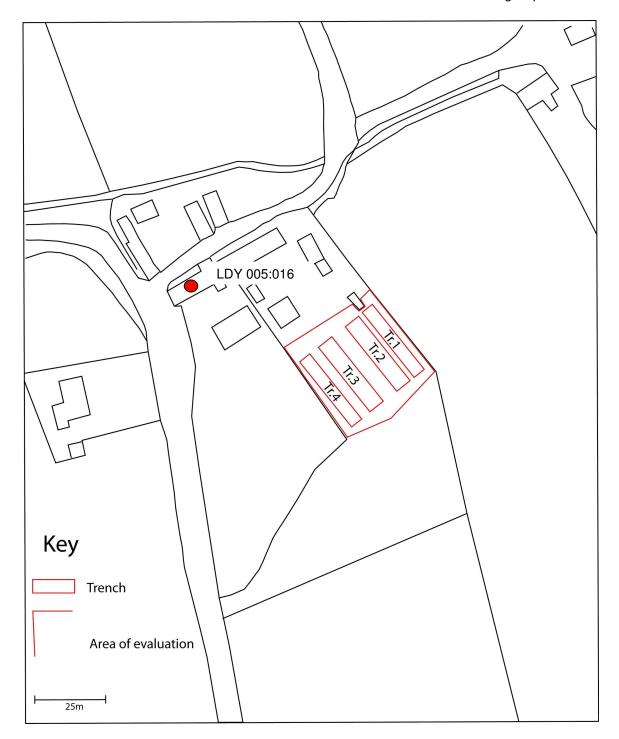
Plan of development site showing location of excavated evaluation trenches and recorded location of an O'CahanTowerhouse SMR LDY 005:016
